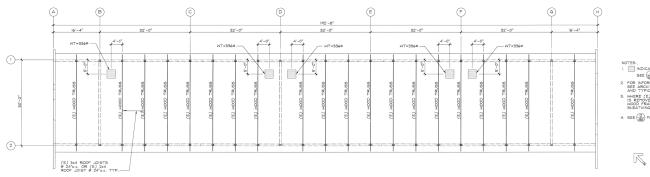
BUILDING 3, 4, & 5: 2017 HVAC Upgrade Roof Framing Plan
